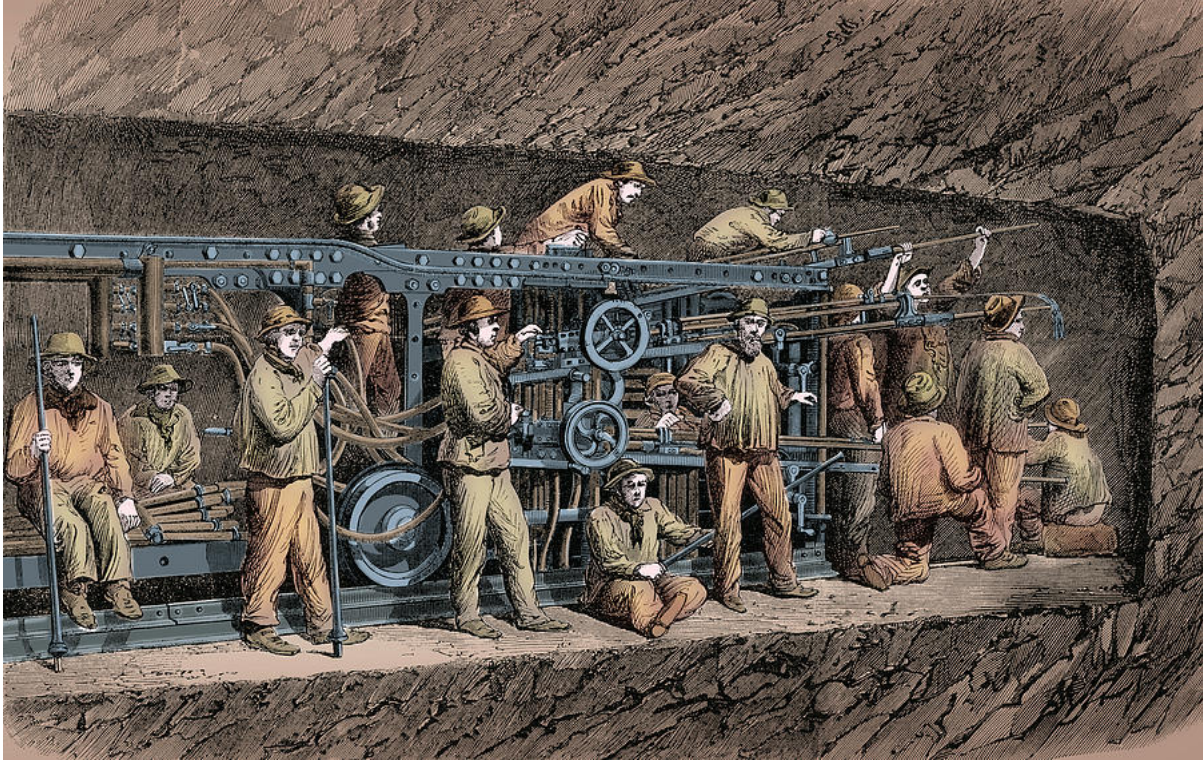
Scheme of boring machine used in the construction of the Mont Cenis tunnel [Routledge, 1903].
